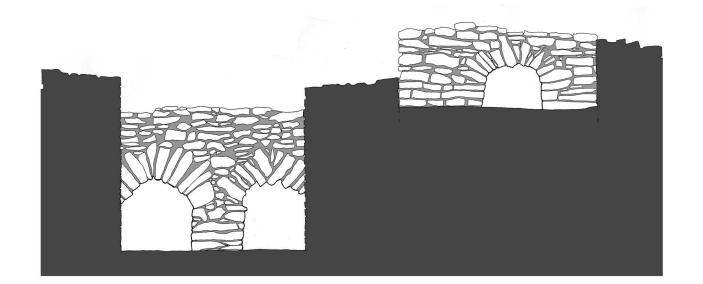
North section building elevation showing the double-arched opening (5054) of garderobe (5052) of (left) and opening (5052) of garderobe (5041) (right).
